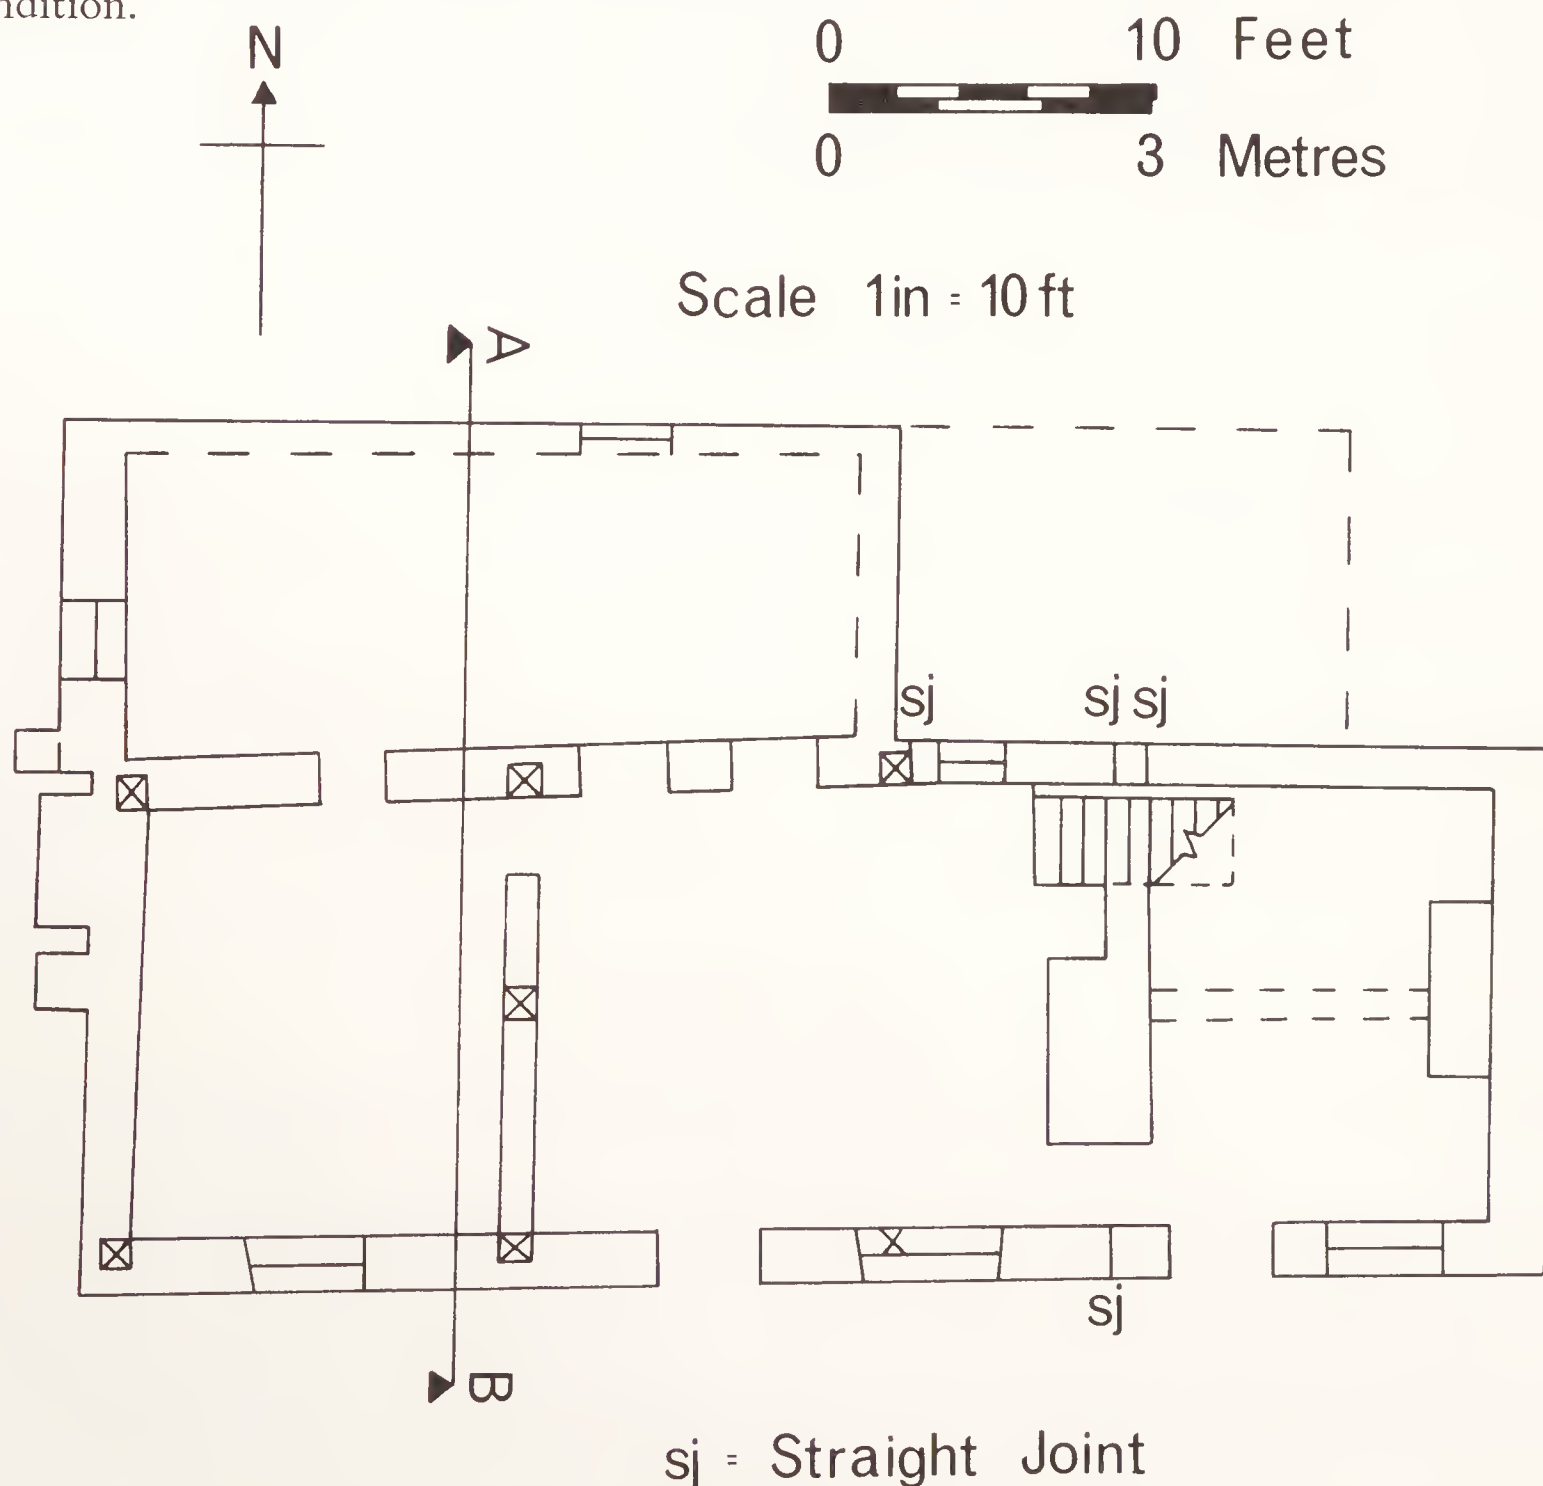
House opposite Rothwell Secondary School, Oulton (Cheesecake Hall), Yorkshire W.R. (SE 360269). Plan, 4.2.1973.
